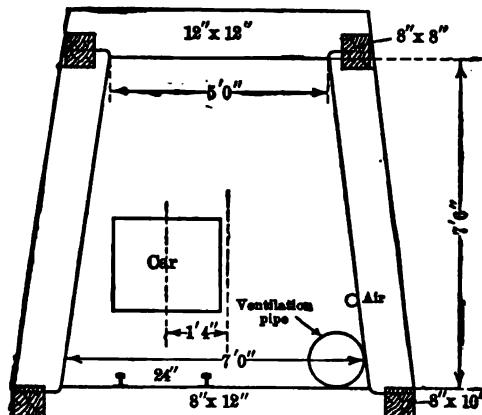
Arrangement of timbering providing a manway at one side of the tunnel.
